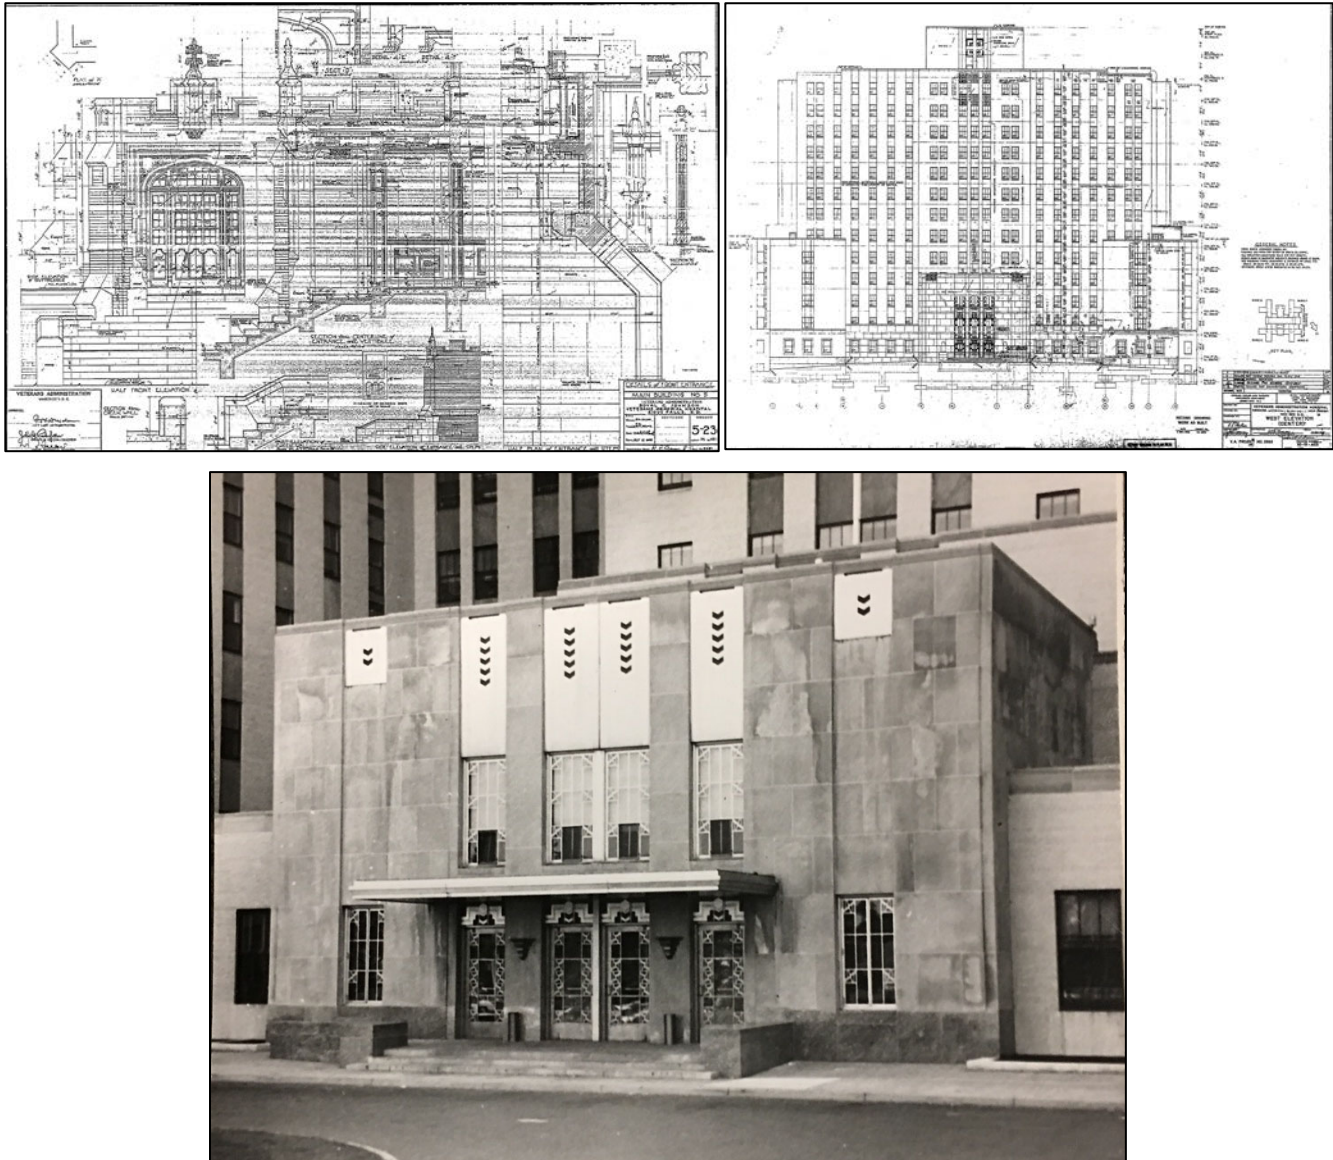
(top left) Detail drawing for the main building at Sioux Falls, South Dakota, reflecting the Collegiate Gothic style of the campus and (top right) elevation drawing for the main hospital building at East Orange, New Jersey; below, detail view of the main entrance, East Orange, New Jersey (VA).
